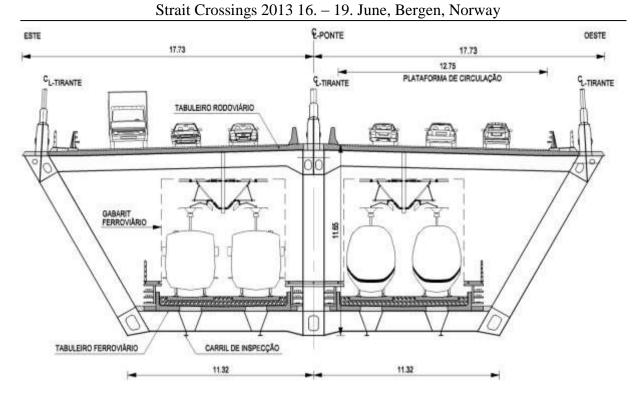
Third Tagus River Crossing, cross section, tender design. Dimensions in [m].
